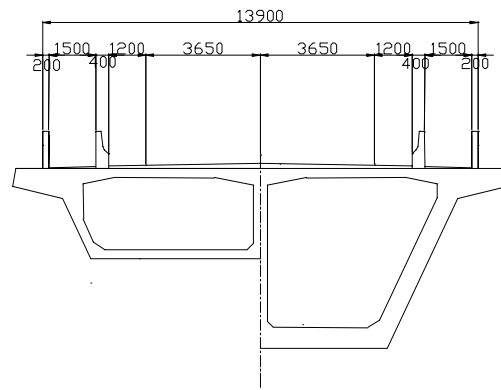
Bridge Cross Section of Naluchi Bridge
